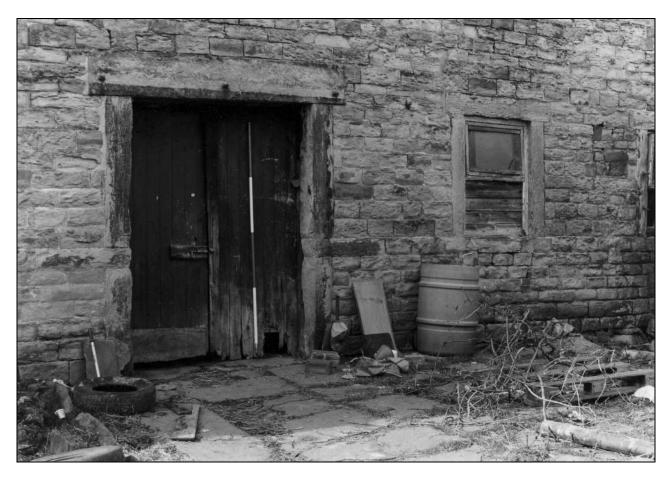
Building 1a: detail of doorway and adjacent openings in east elevation (film 1, frame 16)
